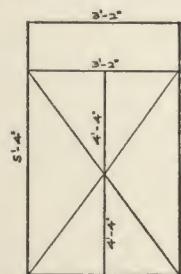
This type of casement window is similar to No. 3 except that a transom is provided, and there is no meeting rail or mullion. To determine the crackage of this window add together the two cracks 5'4" long, one crack 4'4" long and three cracks 3'2" long. Added together the total length is 24'6" or 25' in round numbers.
